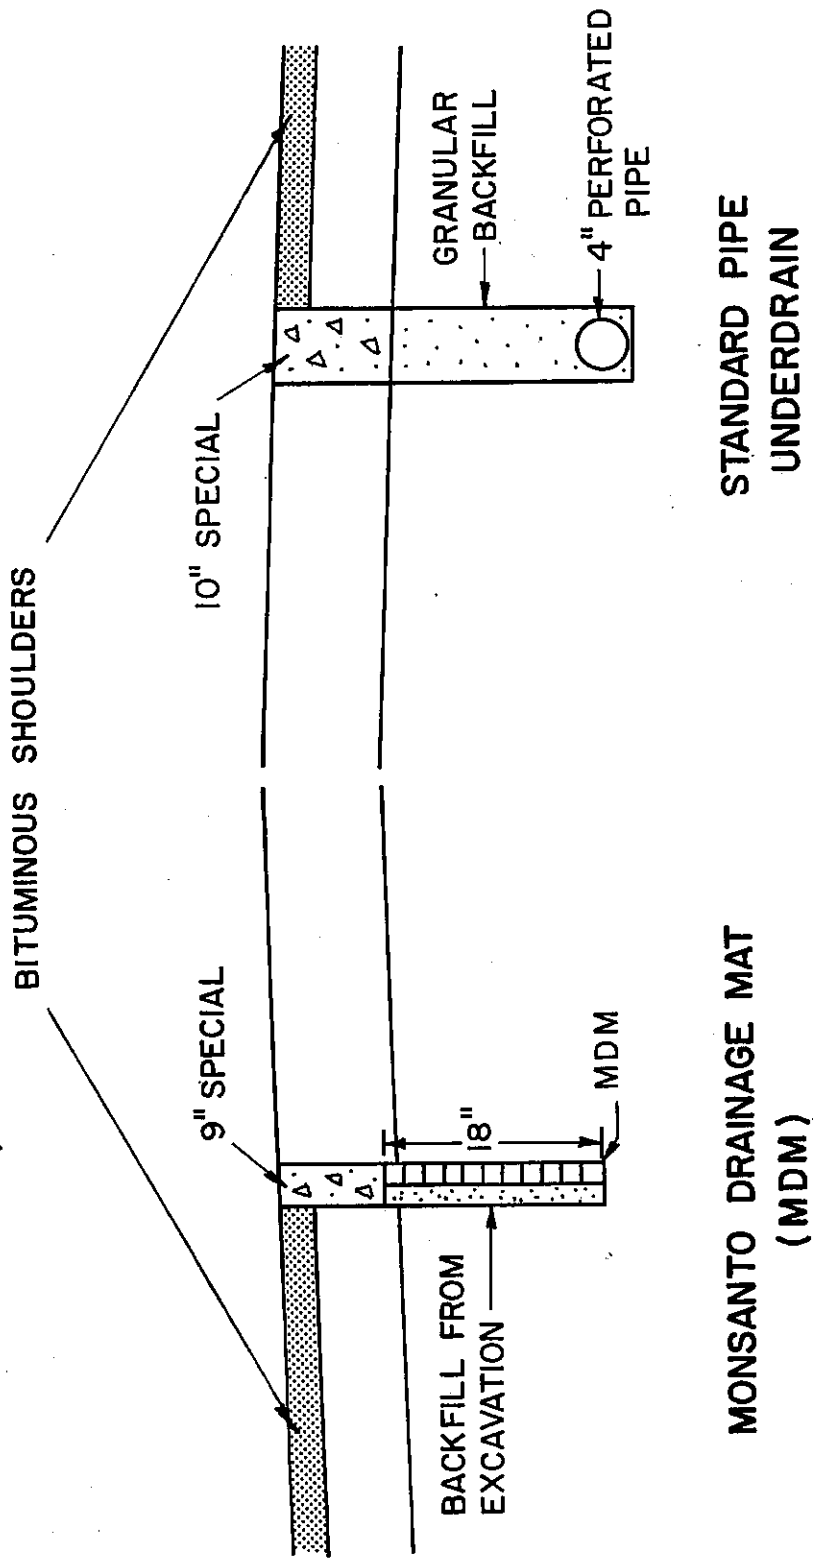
Details of Monsanto Drainage Mat and Standard Pipe Underdrains
